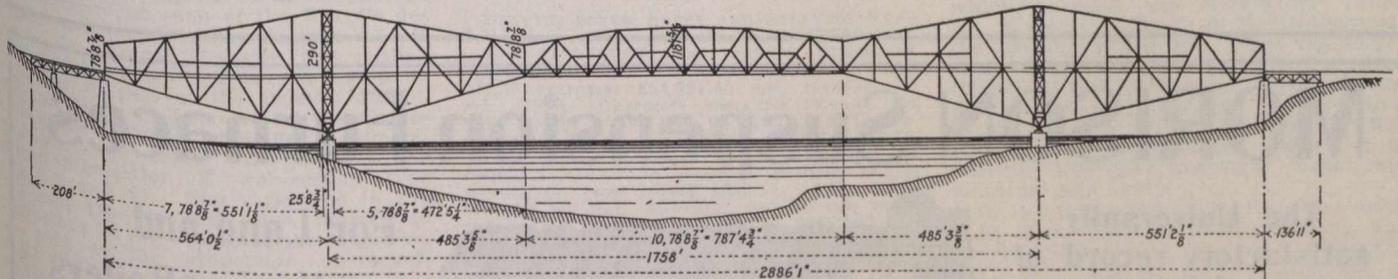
Unaccepted design of Maschinenfabrik Augsburg-Nuerenburg, for Quebec bridge.
